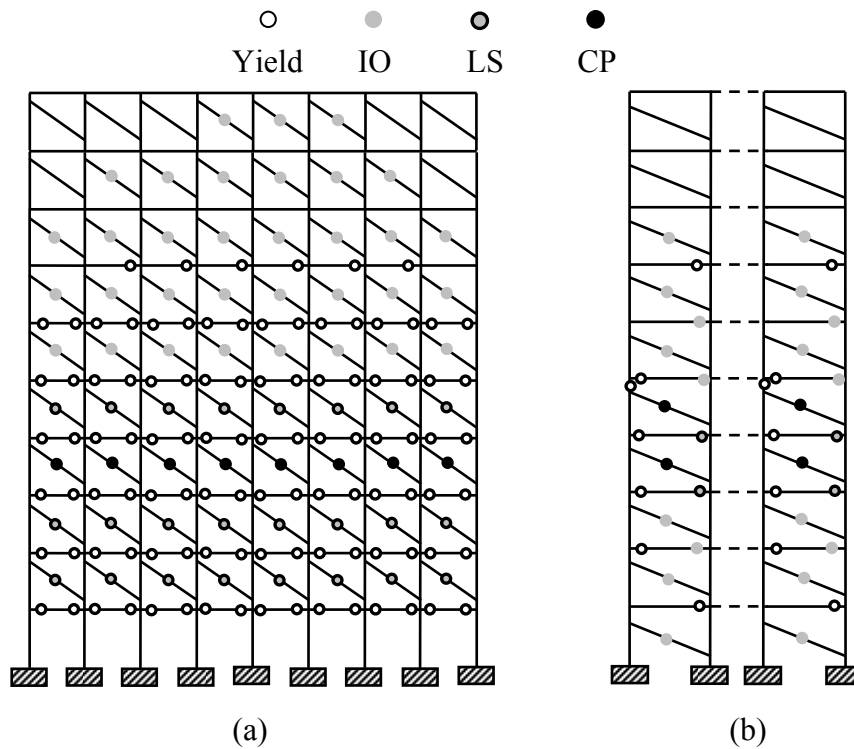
Collapse mechanism of ten storey infilled RC frame buildings designed as SMRF as per relevant Standards with one front bay open in ground storey: (a) open front bay in longitudinal direction; (b) typical transverse frame.
